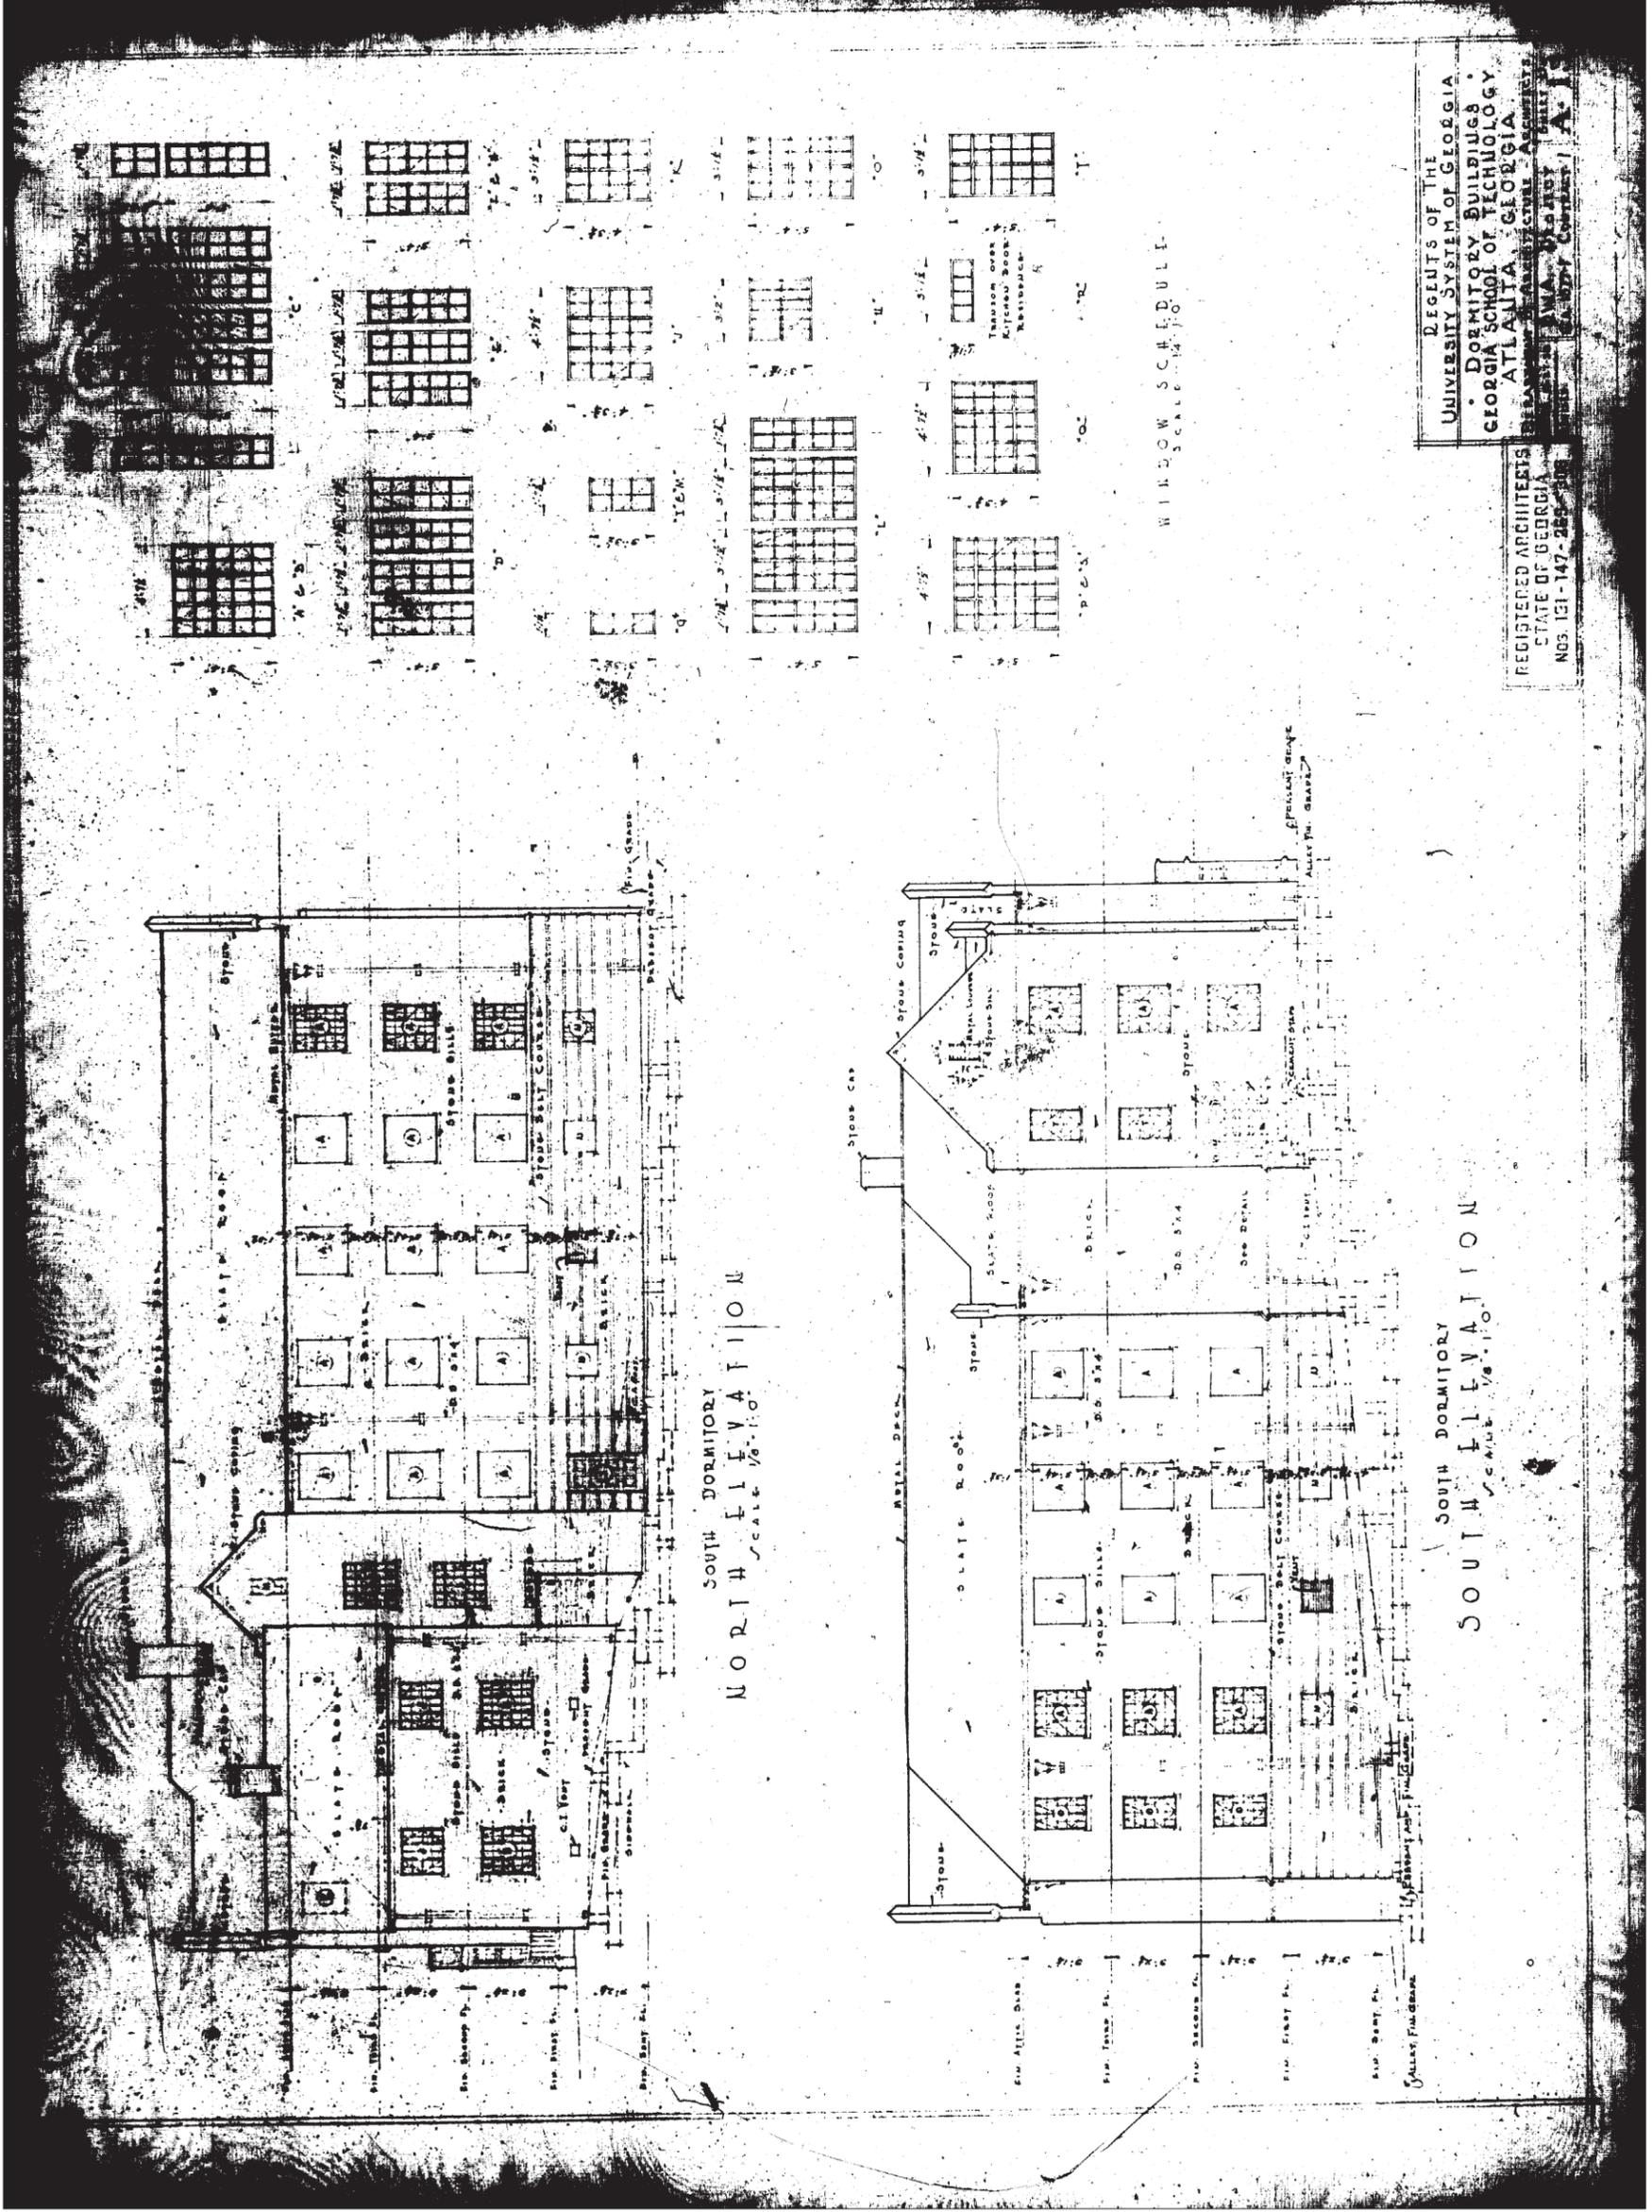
Original 1938 elevation plans for Howell Residence Hall, then known as the South Dormitory.
